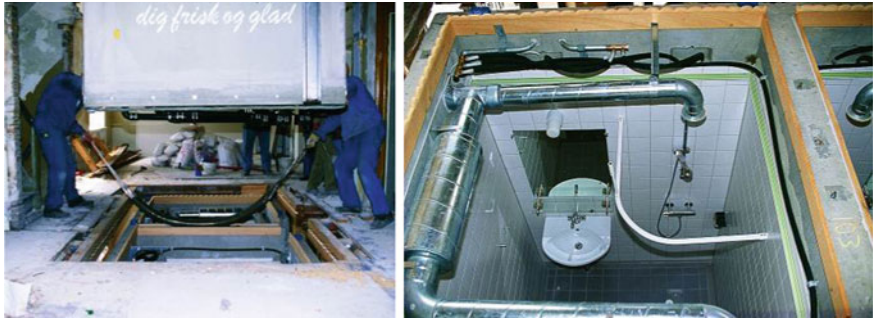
Left* Installation of two cabins as Bathroom #15 with placing of apartment boundary in the middle. *Right* Installed Bathroom #15 cabin seen from above. Pictures from Danish Ministry of Housings (1997)
